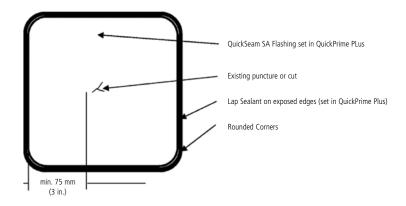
Typical repair of GeoGard EPDM: using QuickSeam SA Flashing
